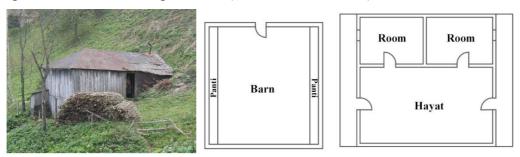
Kayabaşı Highland Dwellings (Çavuş & Altaş, 2010), ground floor and first floor plan (drawn by the author)
